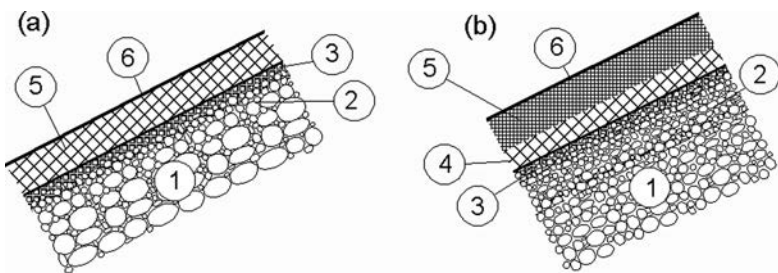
Facing for low protective embankment (a) and for small dams and pumped storage reservoir basins (b). (1) Rockfill; (2) stone chippings; (3) bituminous stabilization; (4) porous asphalt; (5) asphaltic concrete; (6) surface treatment.
